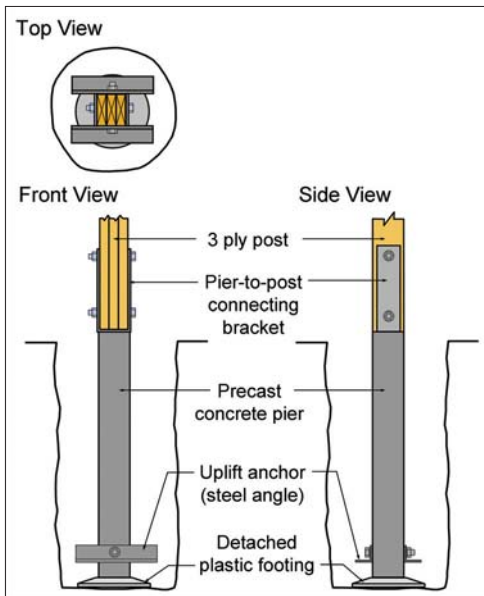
Precast concrete pier foundation with plastic footing and steel angles used for uplift resistance.
